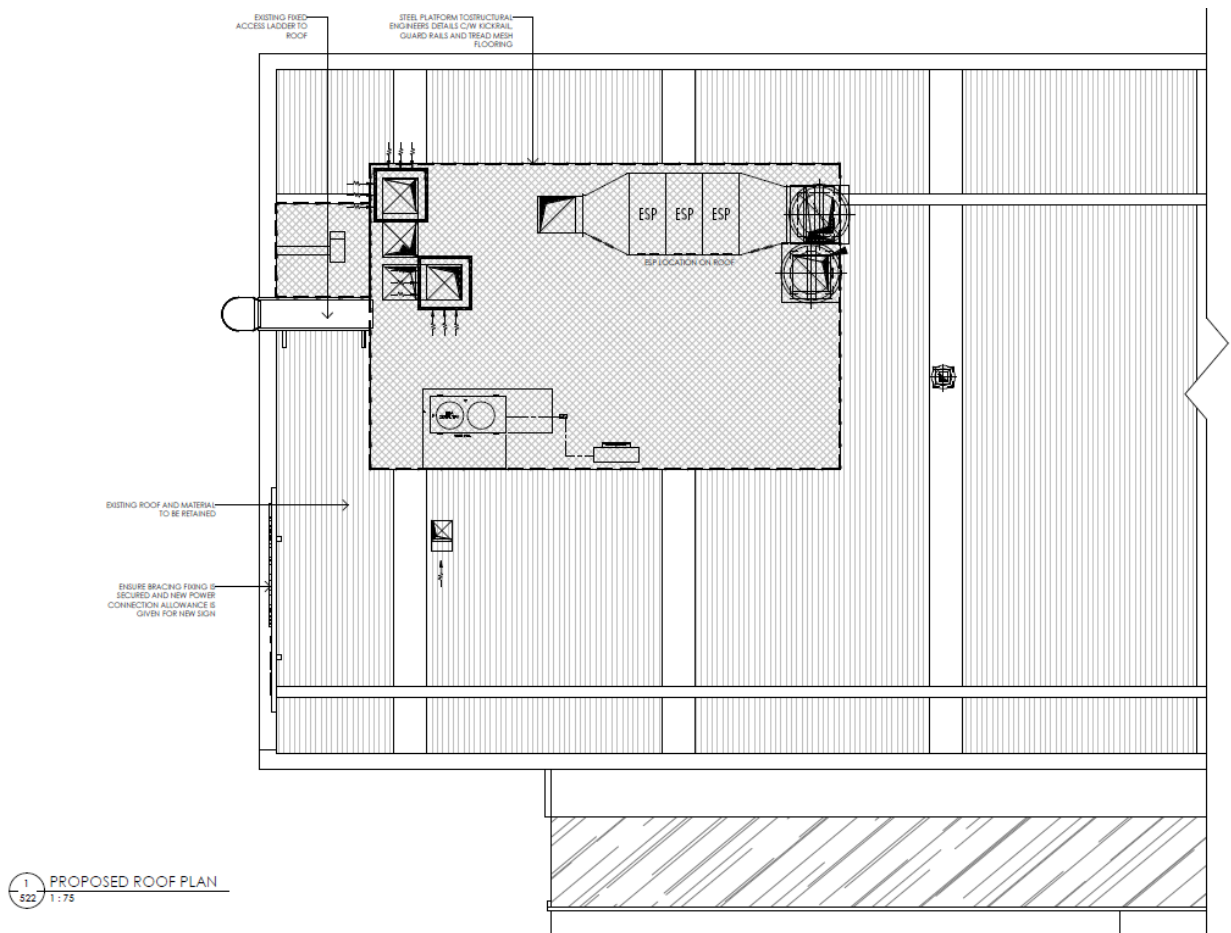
Proposed Roof Plan (Source: Preliminary Drawing by Zone Design, Rev# DA4, Dated 12 August 2024)
